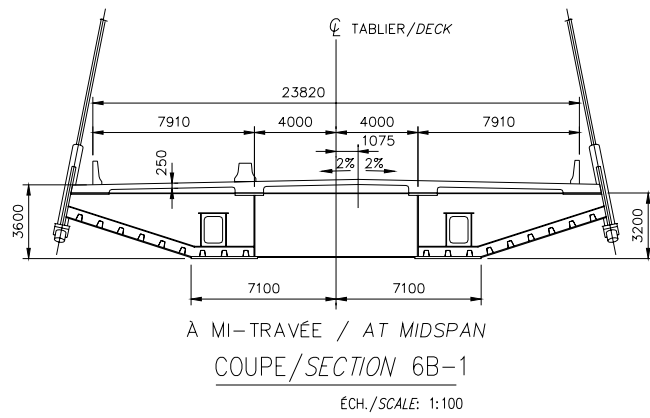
Cross-section – Cable-stayed bridge – Closed girder box solution
